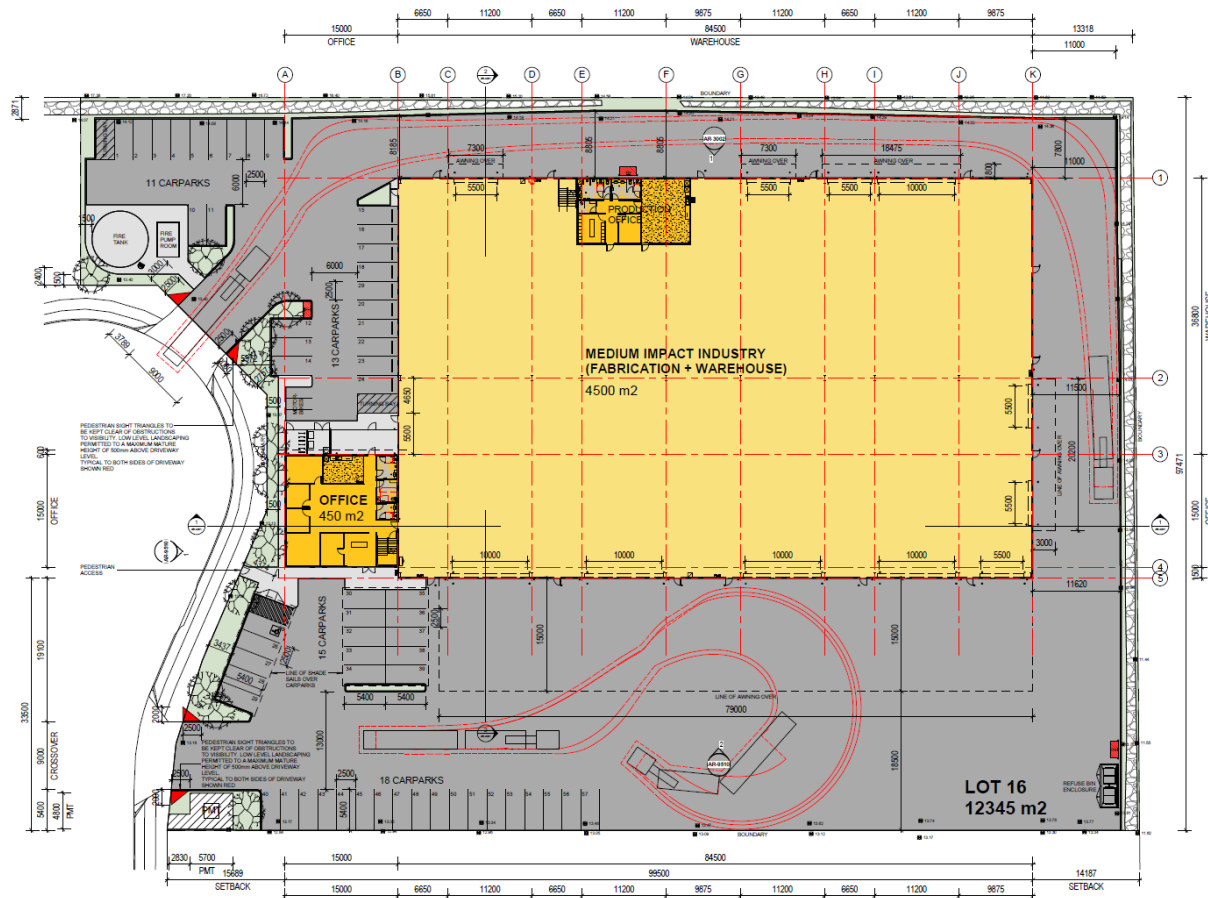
Site plan of proposed development. (Source: Applicant's material)
